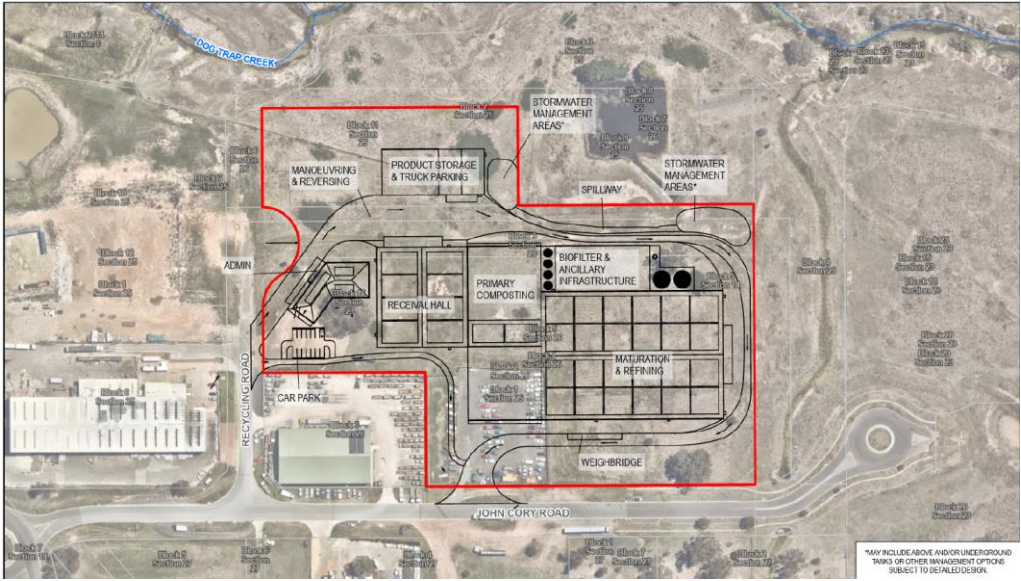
Site plan of the project (source: GHD Final Revised EIS 2025)
